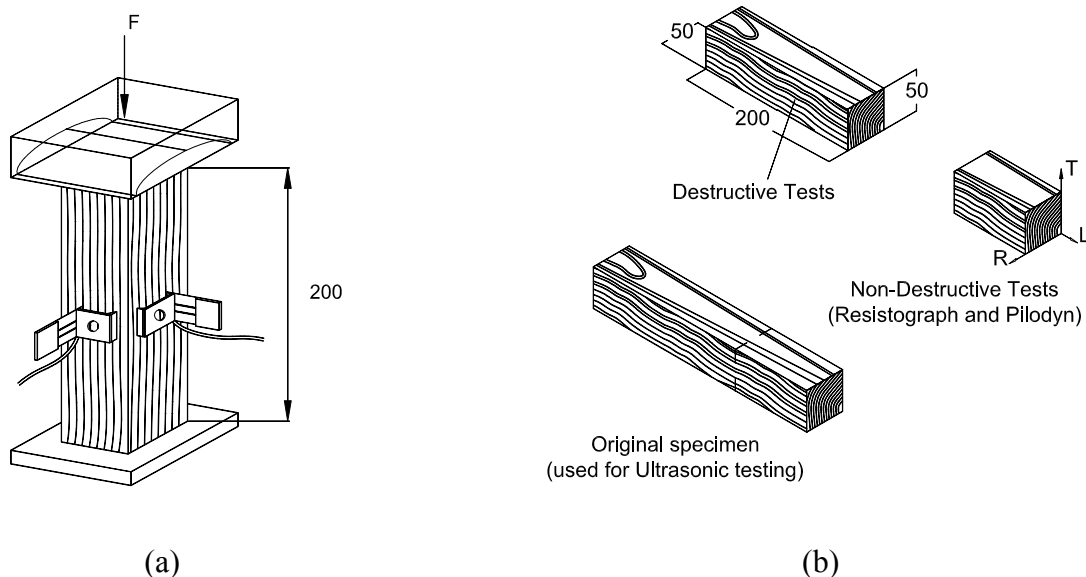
Specimens used in the testing program (nominal dimensions in mm): (a) prismatic test specimen, and (b) compressive and non-destructive tests.
